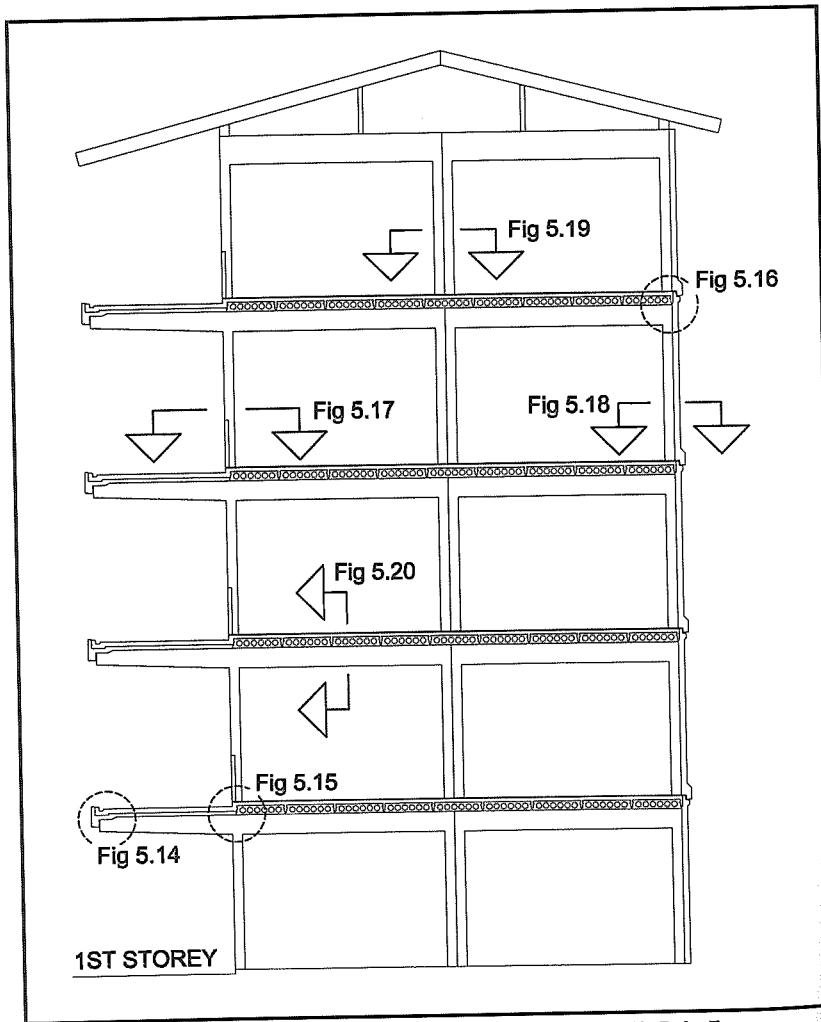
Typical Section Of A Precast Building (Section And Details To Refer To Figures 5.14 To 5.20)
